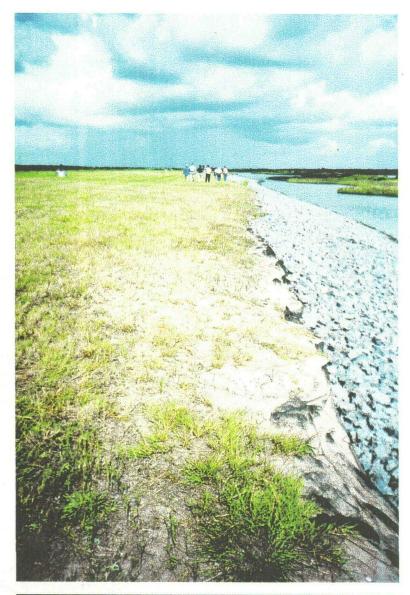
of 23 Date: 7/10/00 Time: 10:25 Taken by: M. Taylor View of north side of the North Dike Area looking west at the sparse, distressed vegetation and liner.
